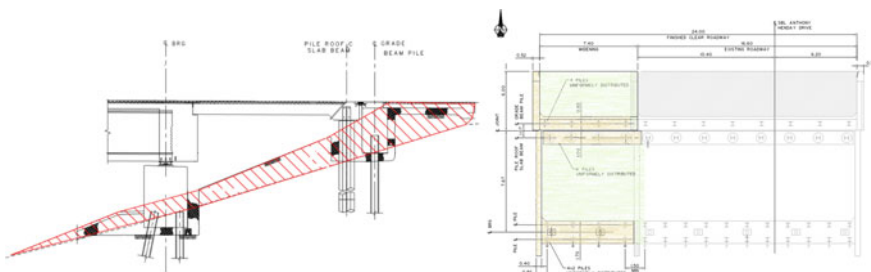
Additional embankment required for abutment widening (left), plan of the widening abutment (right)
